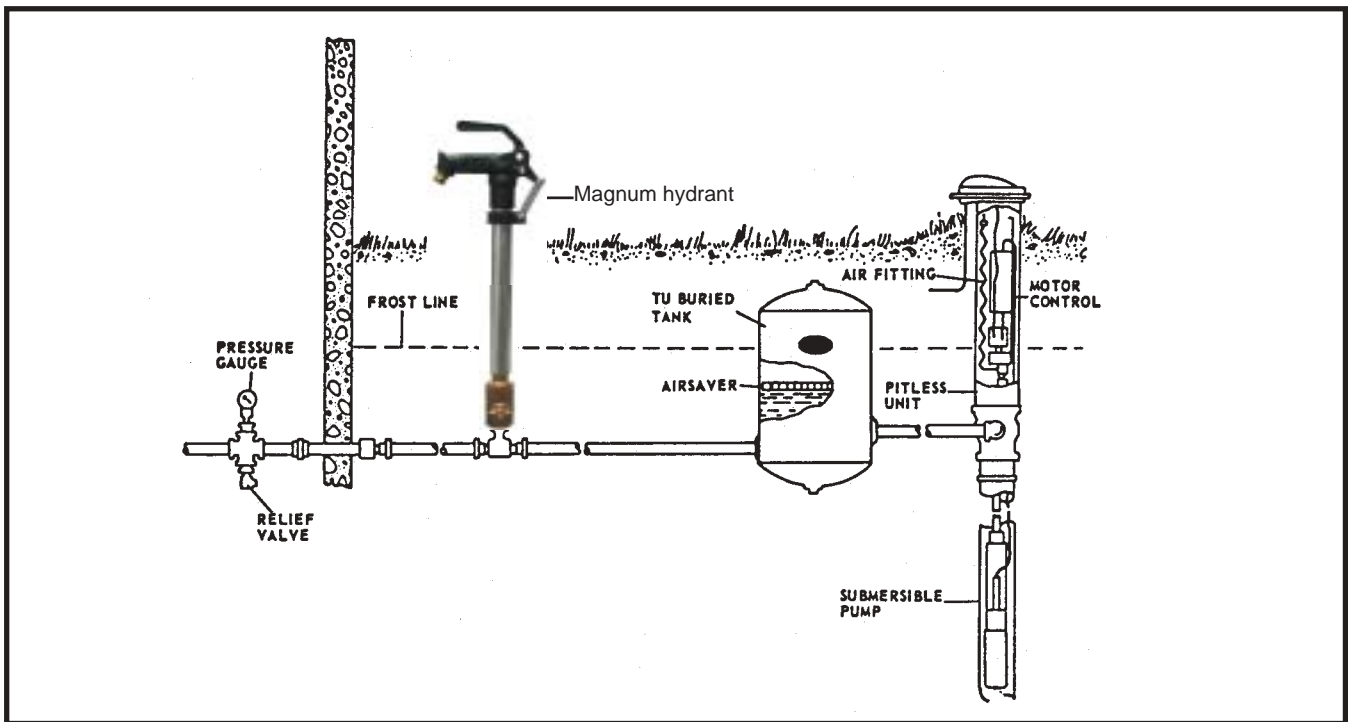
TYPICAL AT-THE-WELL SUBMERSIBLE PUMP INSTALLATION SHOWING OAWSP CONTROL KIT, 8AWC AIR FITTING AND TU AIR SAVER UNDERGROUND TANK.
